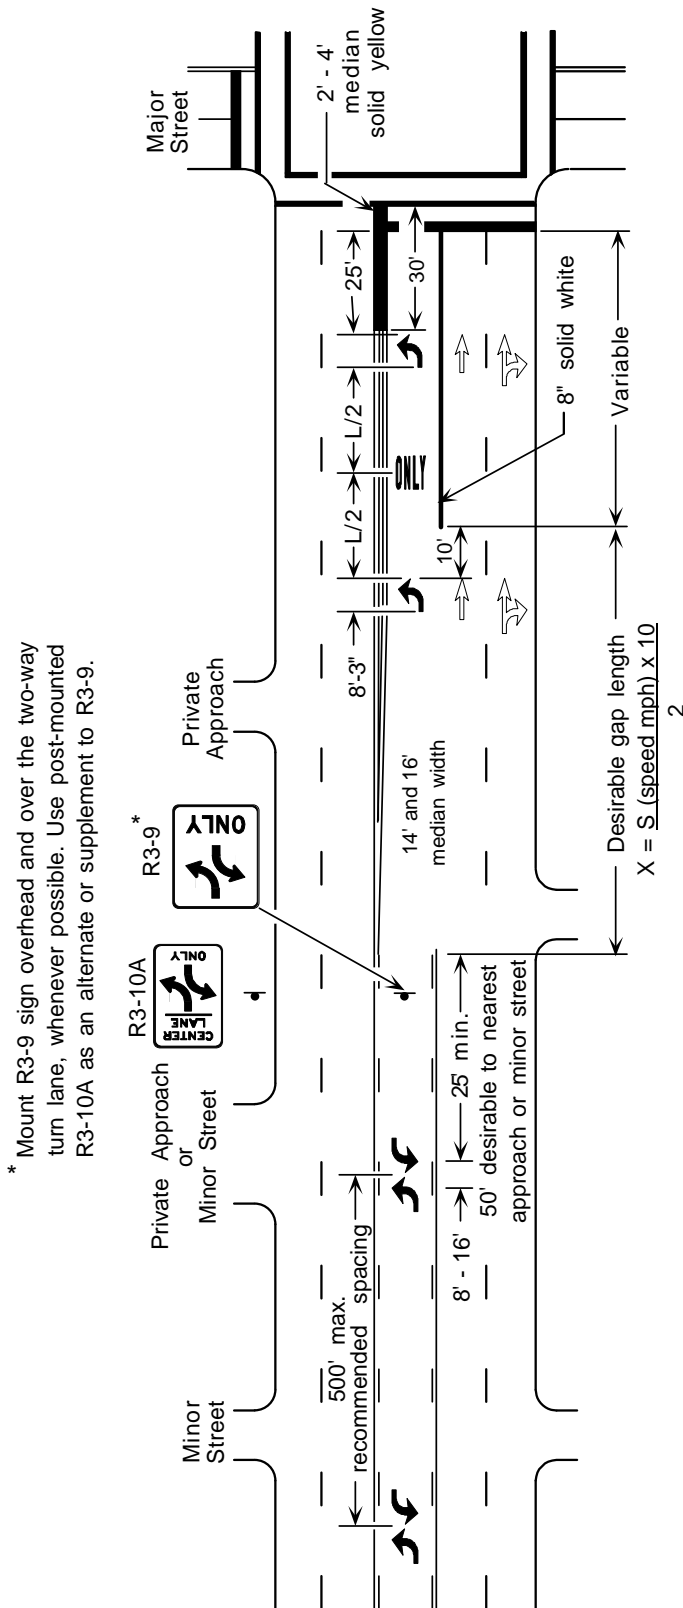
Painted Pavement Markings At Signalized Intersections
